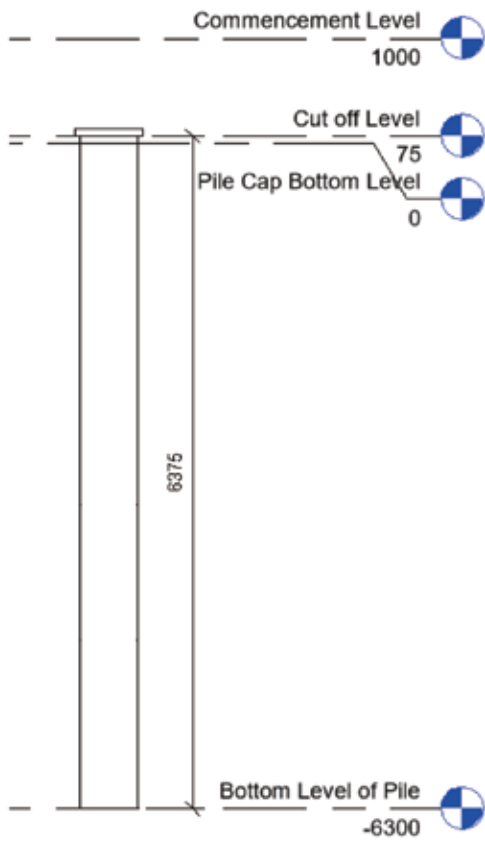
Elevation View of Rock-Socketed H-Pile
